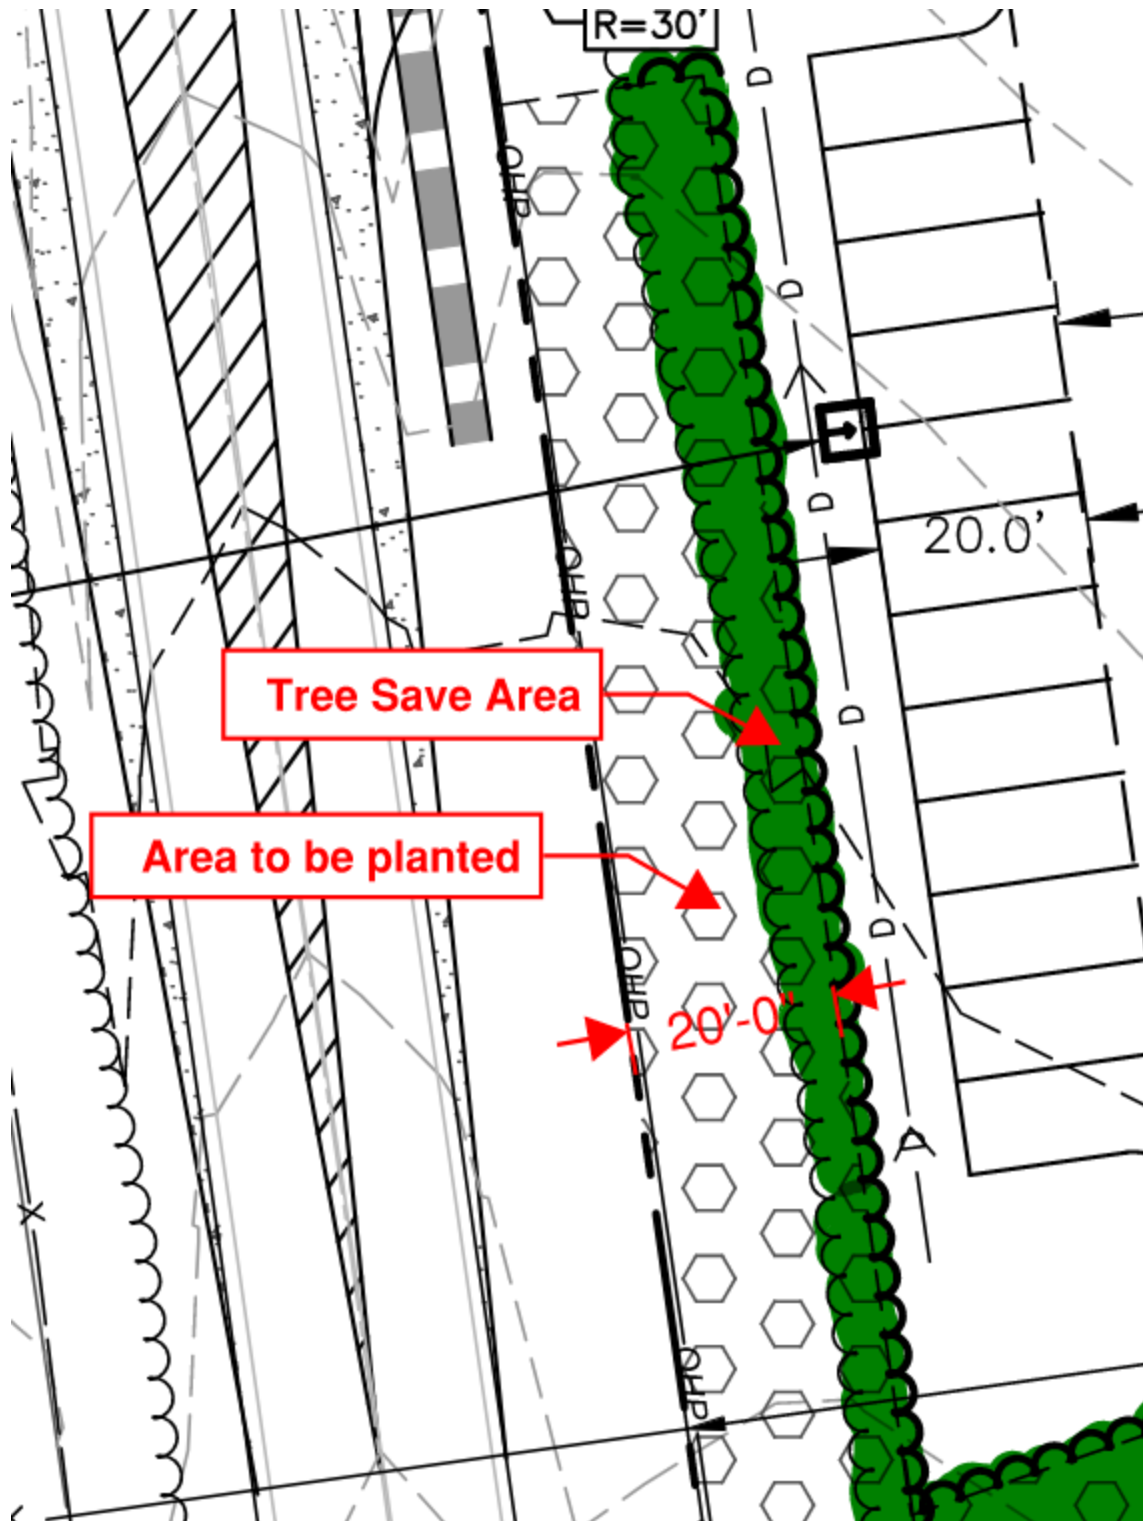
Excerpt from submitted Preliminary Landscape Plan
